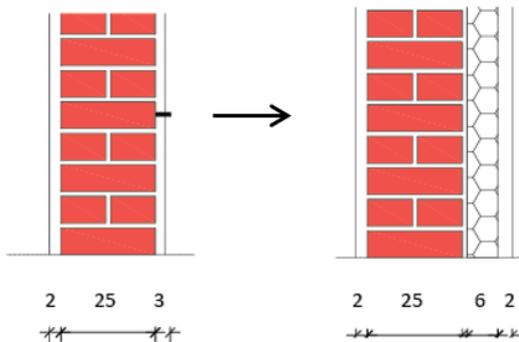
Possible interventions in the façade with traditional brick walls, by adding a layer of thermal insulation.
